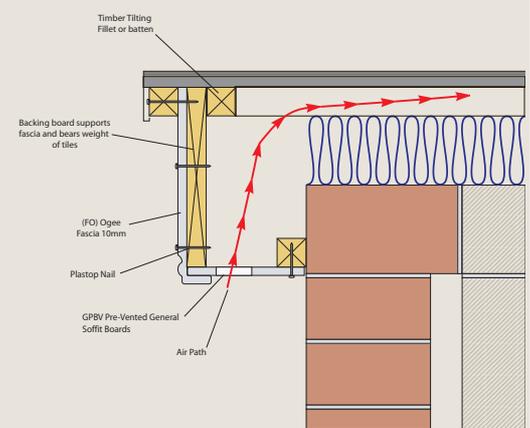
Refurbishment of flat roof eaves and soffit, incorporating ventilation.
